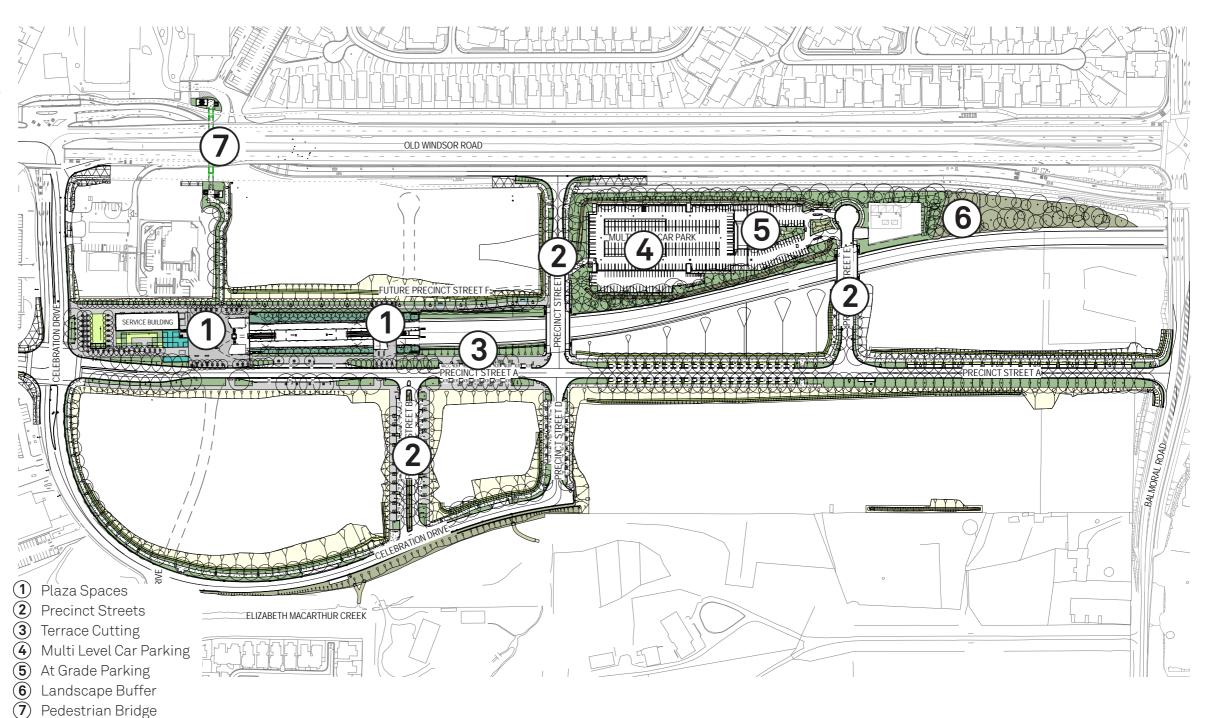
BLV\_Landscape Site Plan. Source: HASSELL.
